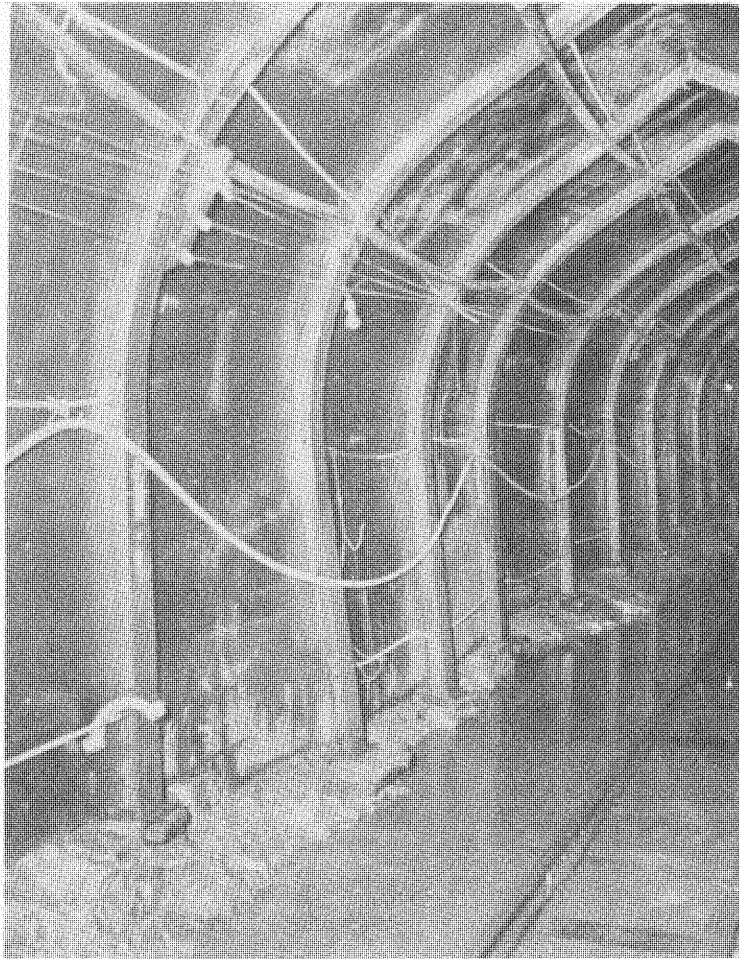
View of tunnel section showing typical sheet metal panning used through wet sections. P783-908-1662, July 15, 1954.
